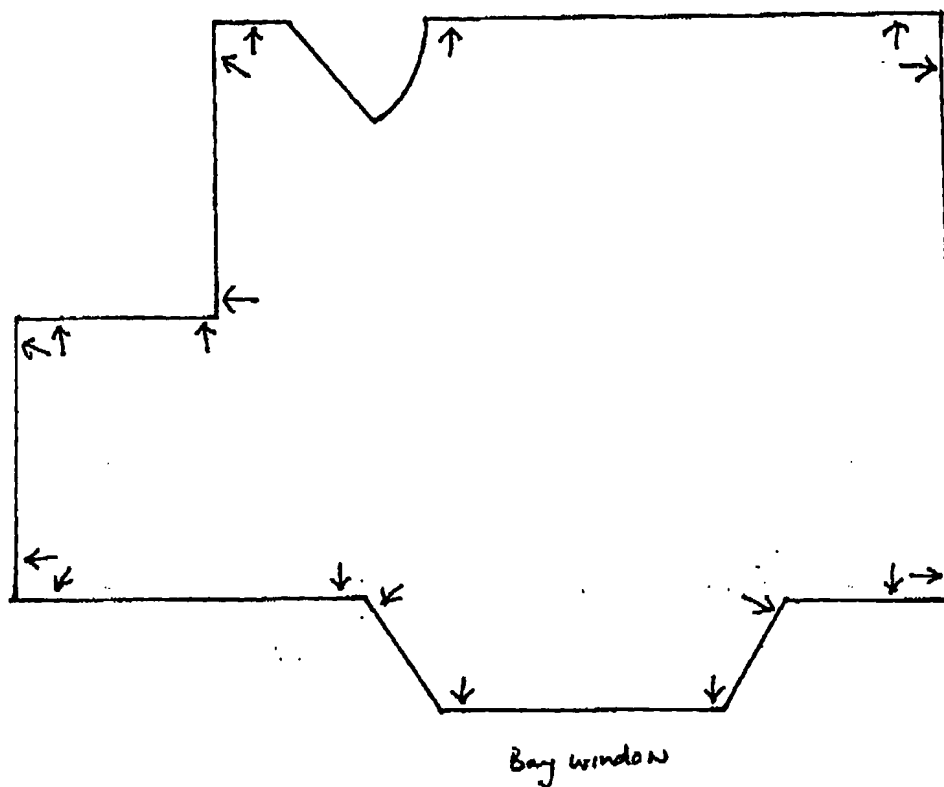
Showing potential Termiview Bait Station locations around a room in a new or existing building or house(↑).
